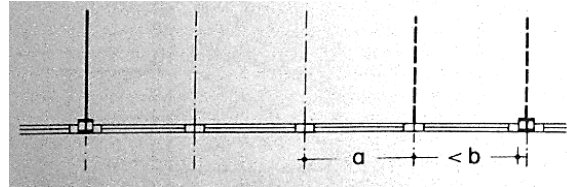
Examples of envelopes, placed in the structural plane – large scale.
